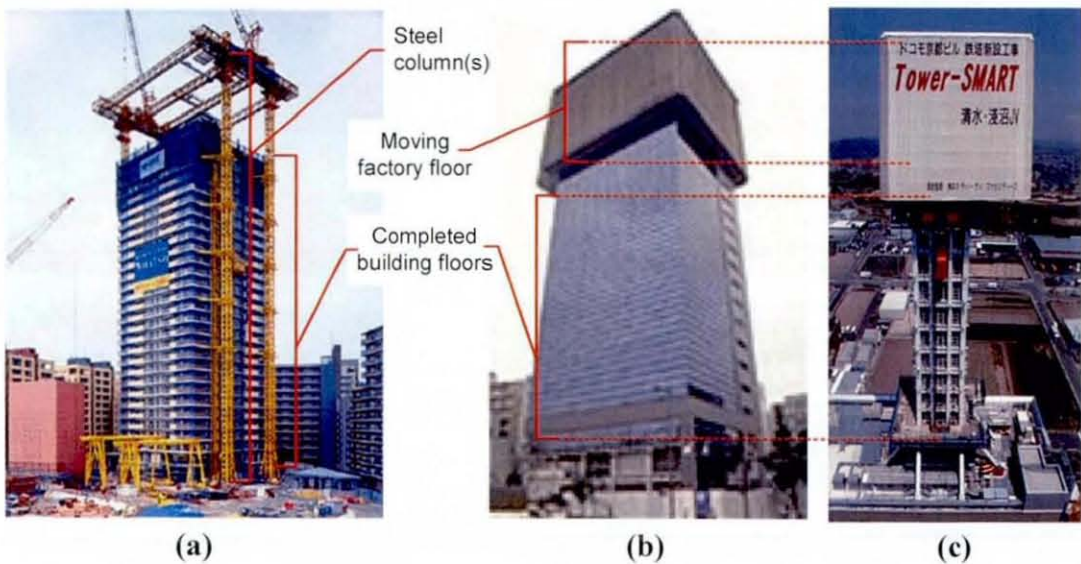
Shimizu Corp.'s SMART System: (a) construction of residential tower in Chiba, (b) Construction of the Joroku Bank building in Nagoya, Japan, (c) Tower SMART.
